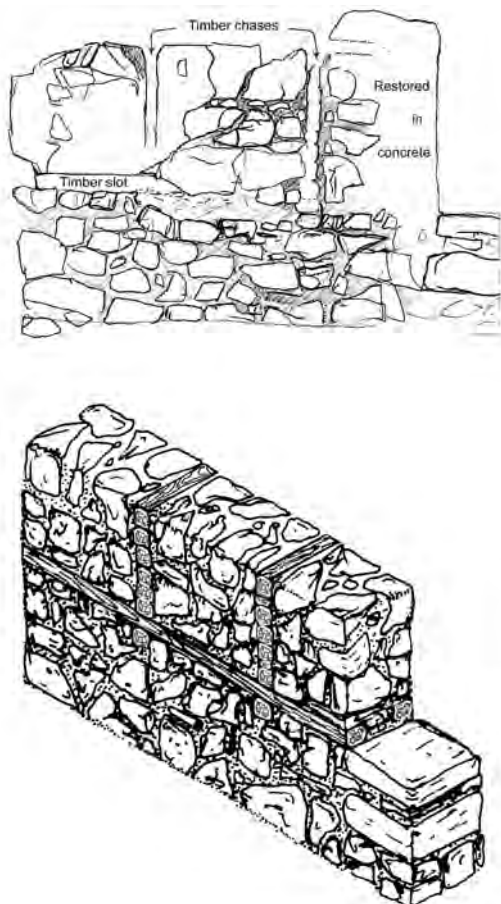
Mycenae. Wall of Tsountas House, sketch and reconstruction by James C. Wright (*Wright 2006, Fig. 1.10*).
